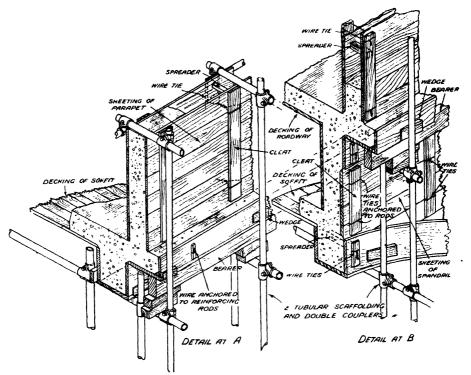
ENLARGED DETAIL OF A AND B IN FIG. 10
